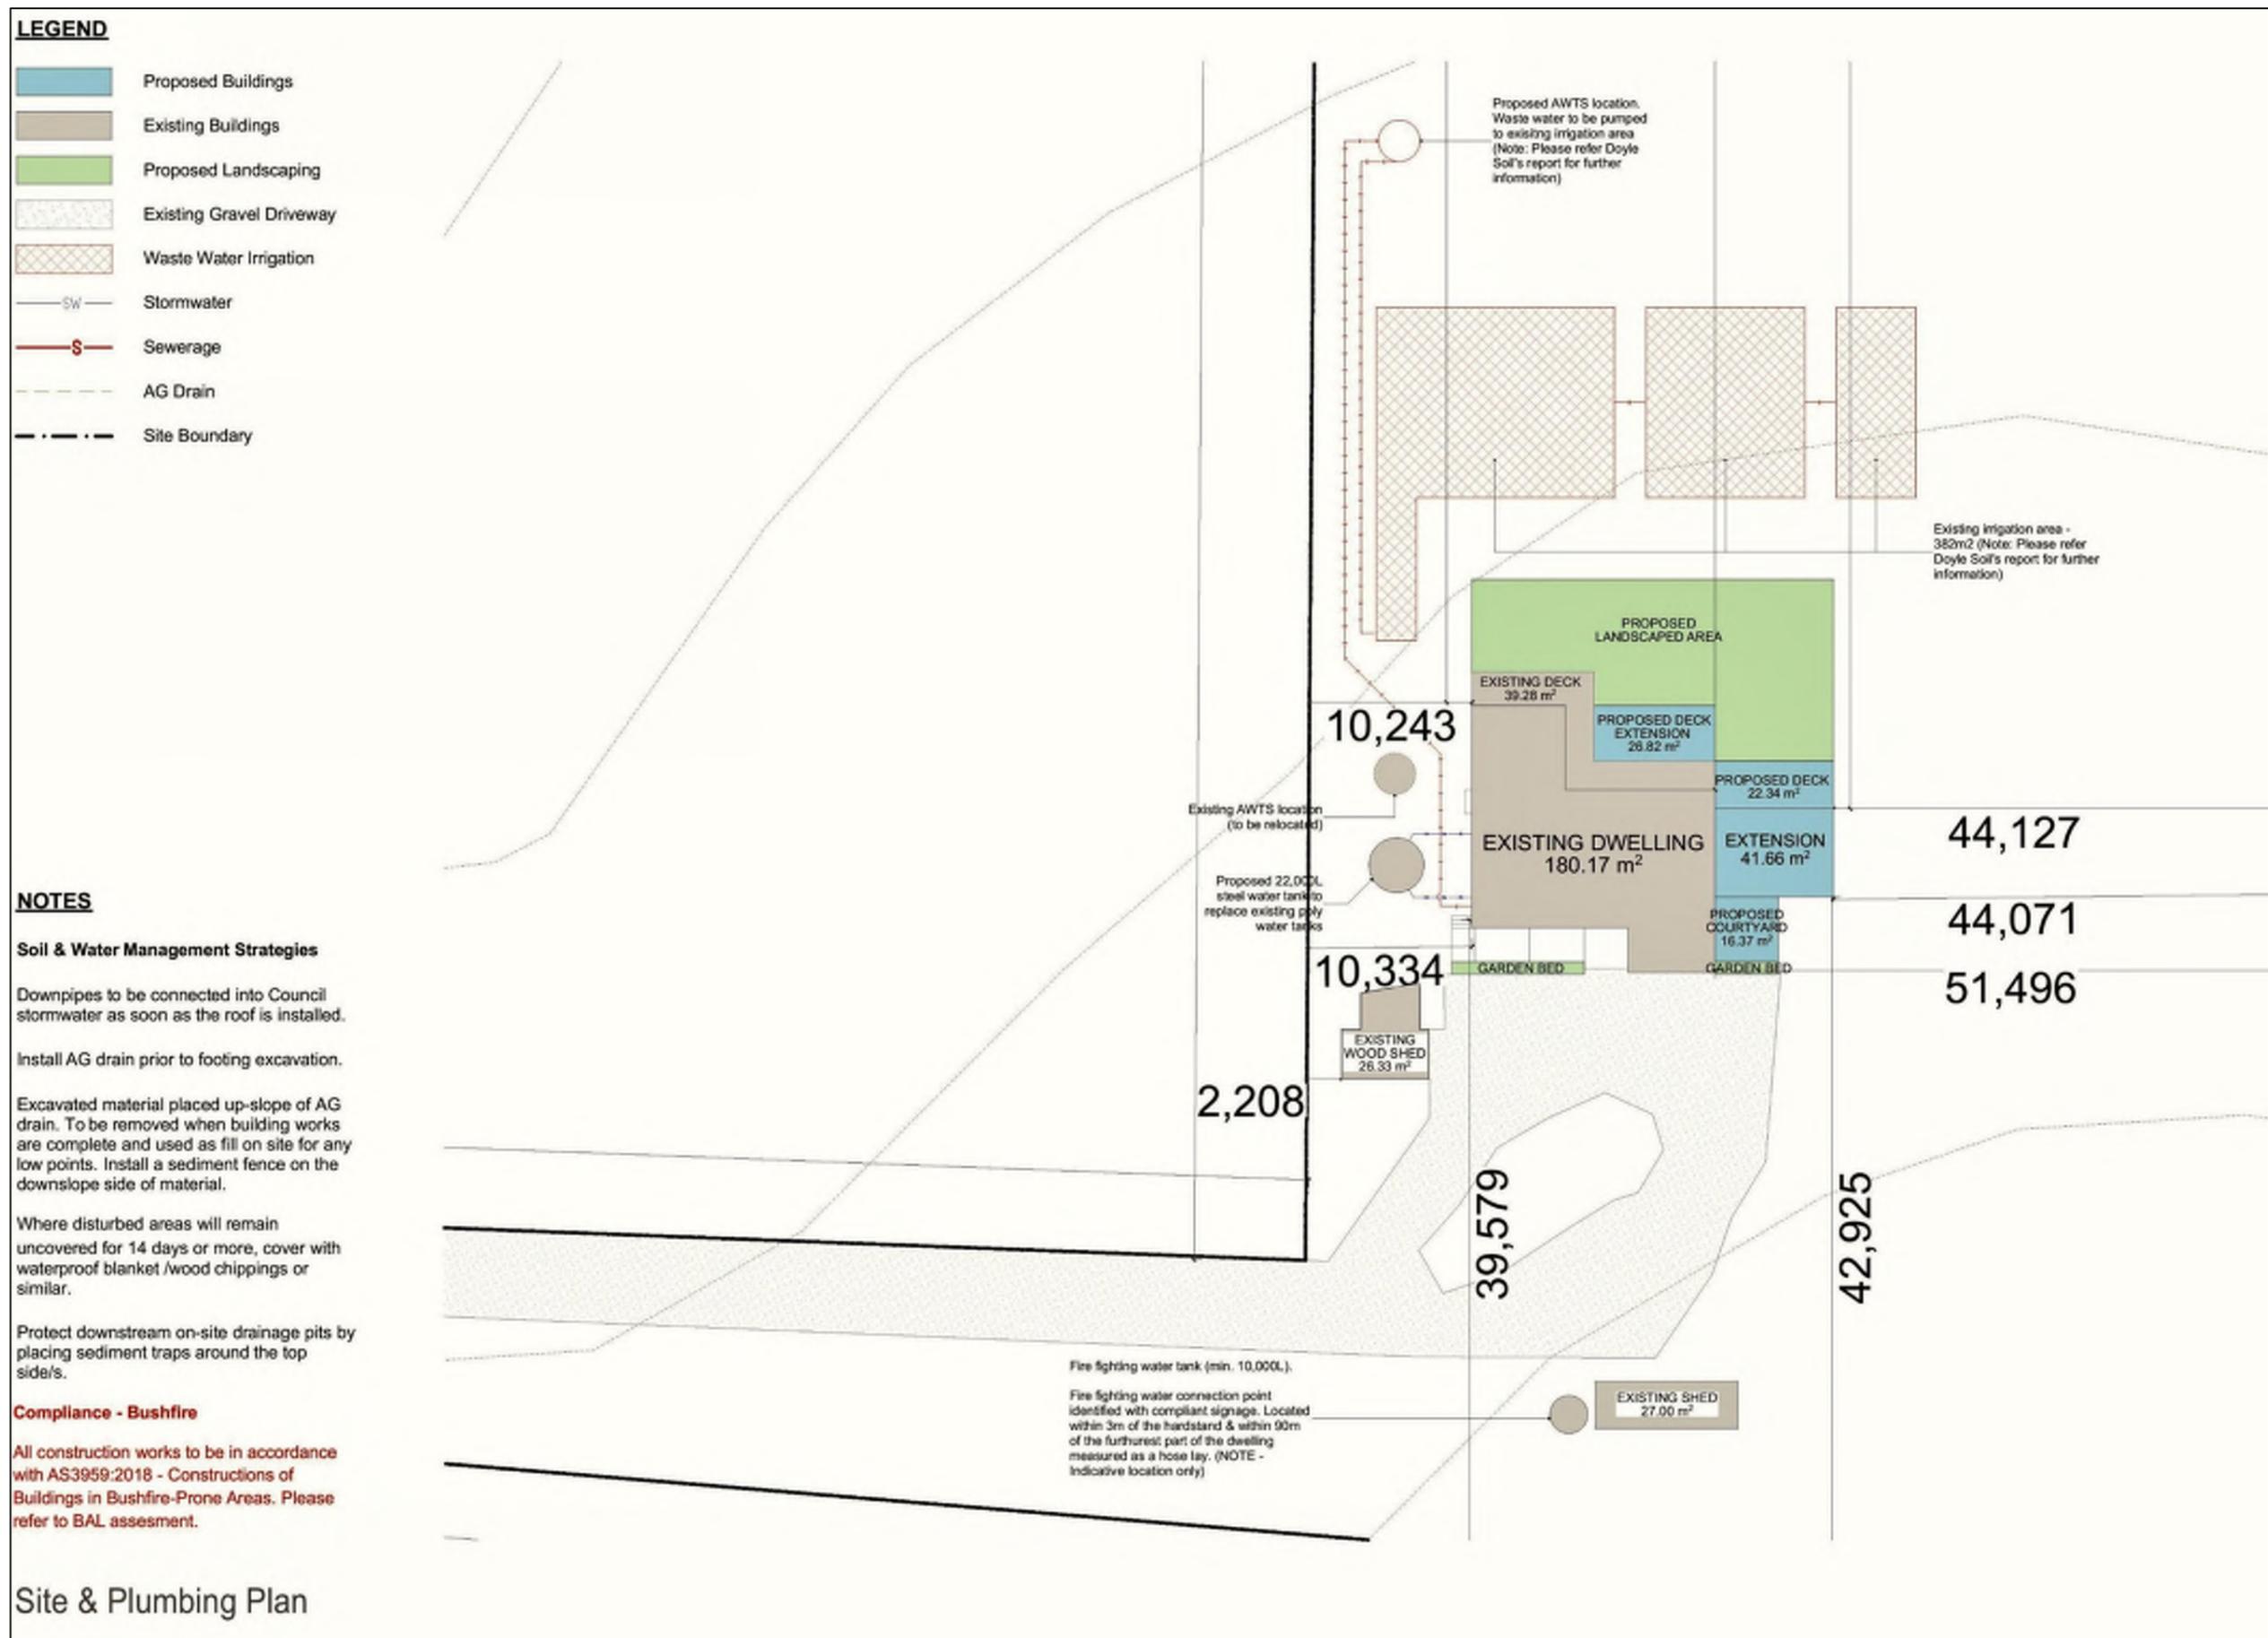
1:400 Site Plan (cropped from page 3 of the development application by Matt Kennedy Drafting and Design)
